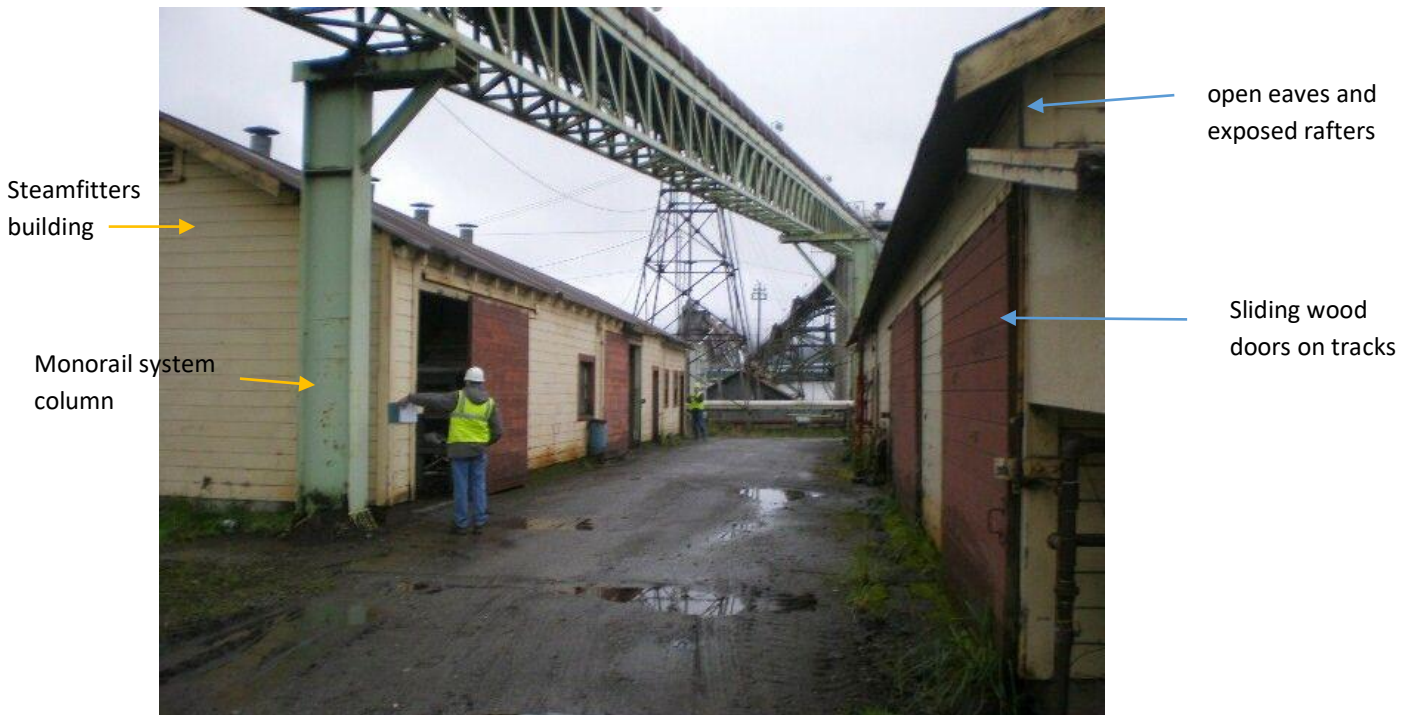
2.F north view of west facing exterior wall, sliding wood doors, open eaves and exposed rafters.
